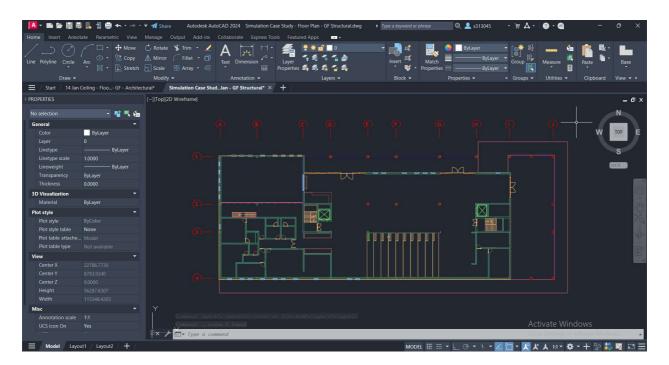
Ground floor plan in AutoCAD after applying changes, Elaborated by Authors
